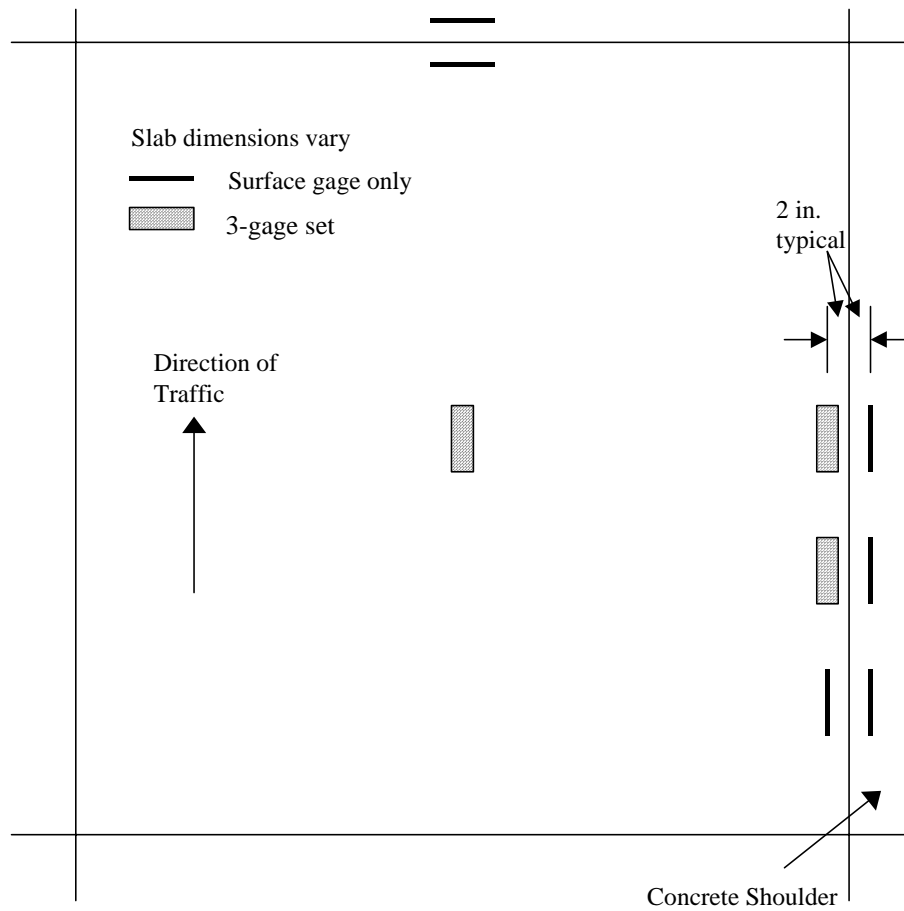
Typical Test Slab Strain Gage Layout – Plan View
